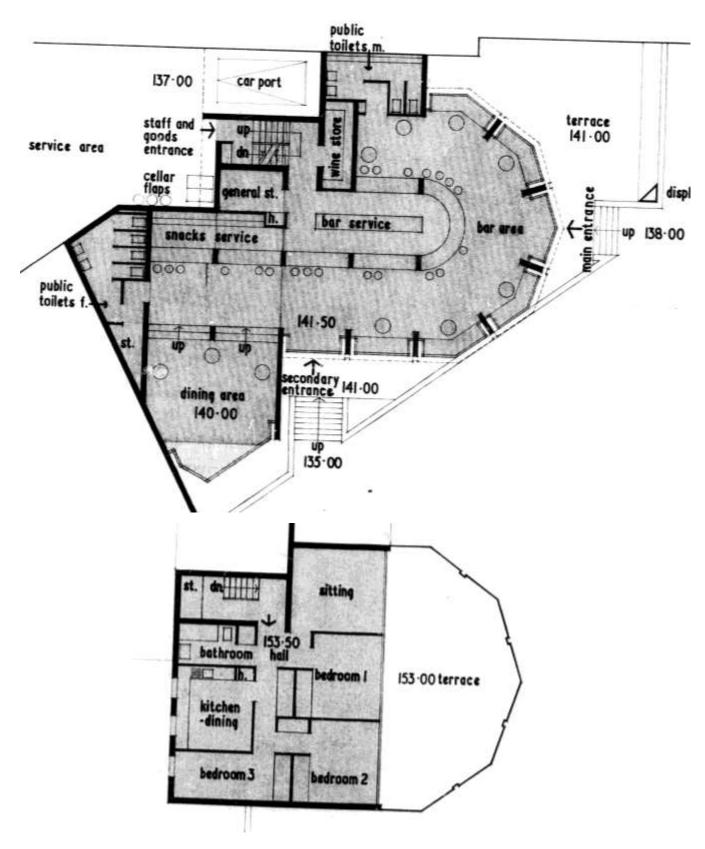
& 5 Austin-Smith, Salmon, Lord Architects planning application drawings for Ground Floor Public House and First Floor Flat. (Source: Exeter City Council Planning)
